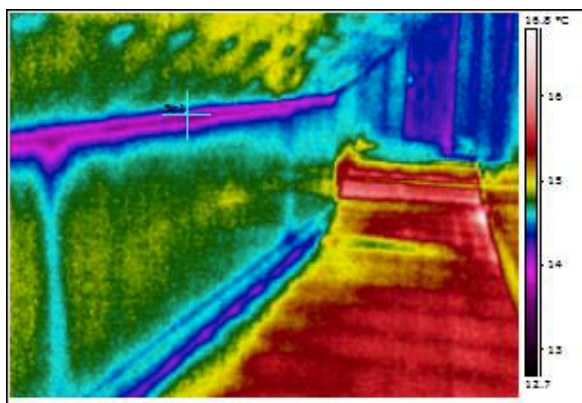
Room S12, attic space. The image shows thermal bridges at the junctions between wall and roof in the second floor.
